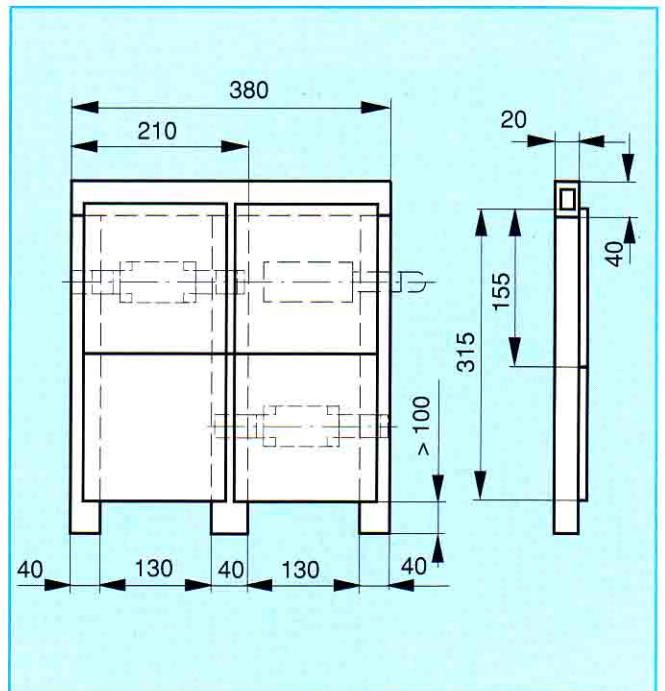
Twin-section mounting frame to accept Size 6 elements
